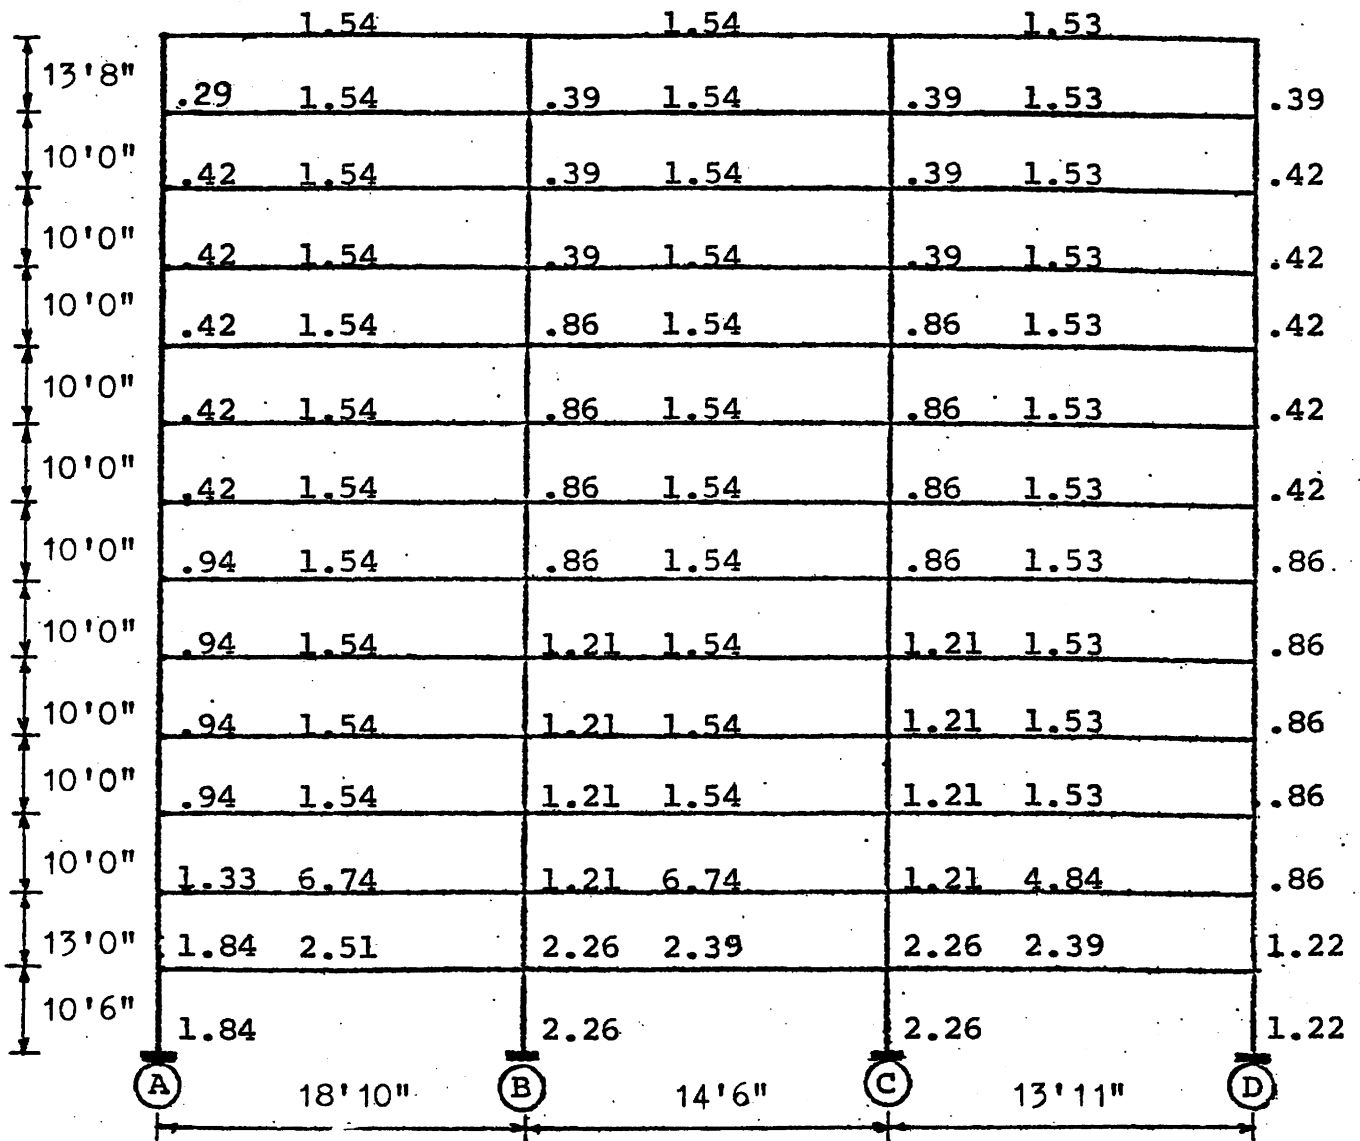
Selected Frame in Building 3 with Moments of Inertia for Beams and Columns, (ft⁴)
